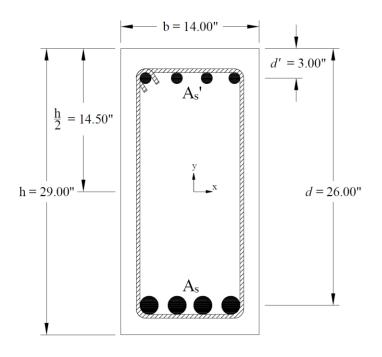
Doubly Reinforced Concrete Beam Cross-Section
